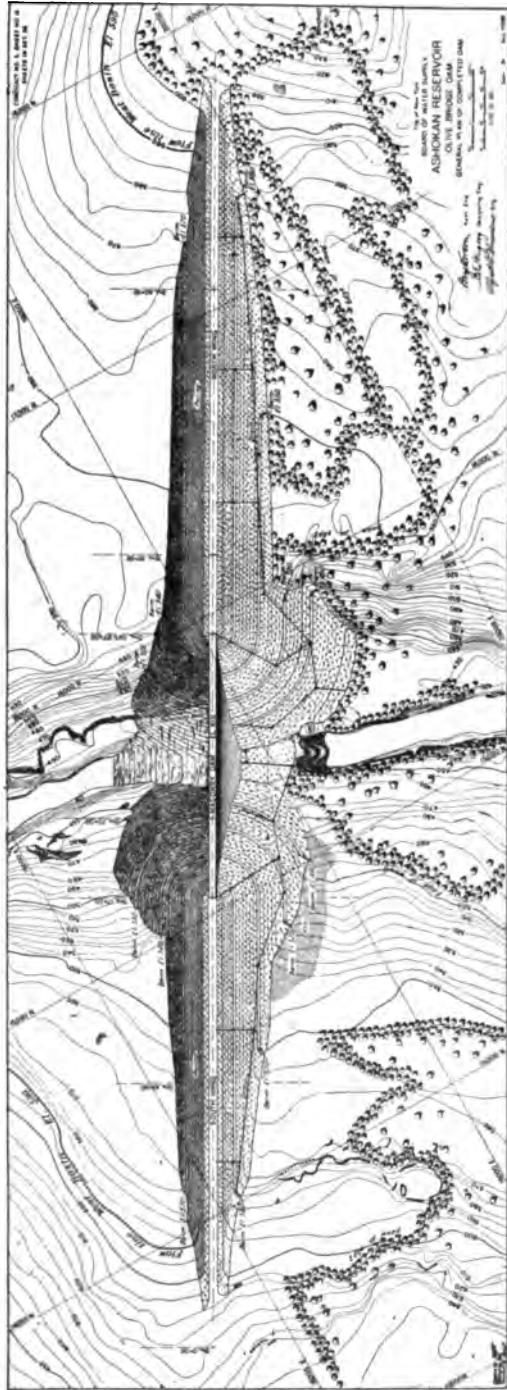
General Contour Plan of Olive Bridge Dam, as per Contract Drawings.
